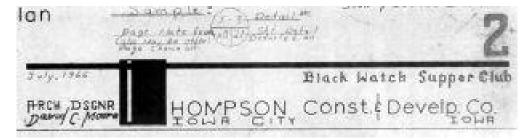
David C. Moore is named as architect/designer on the 1966 plans (Highlander Archives)
